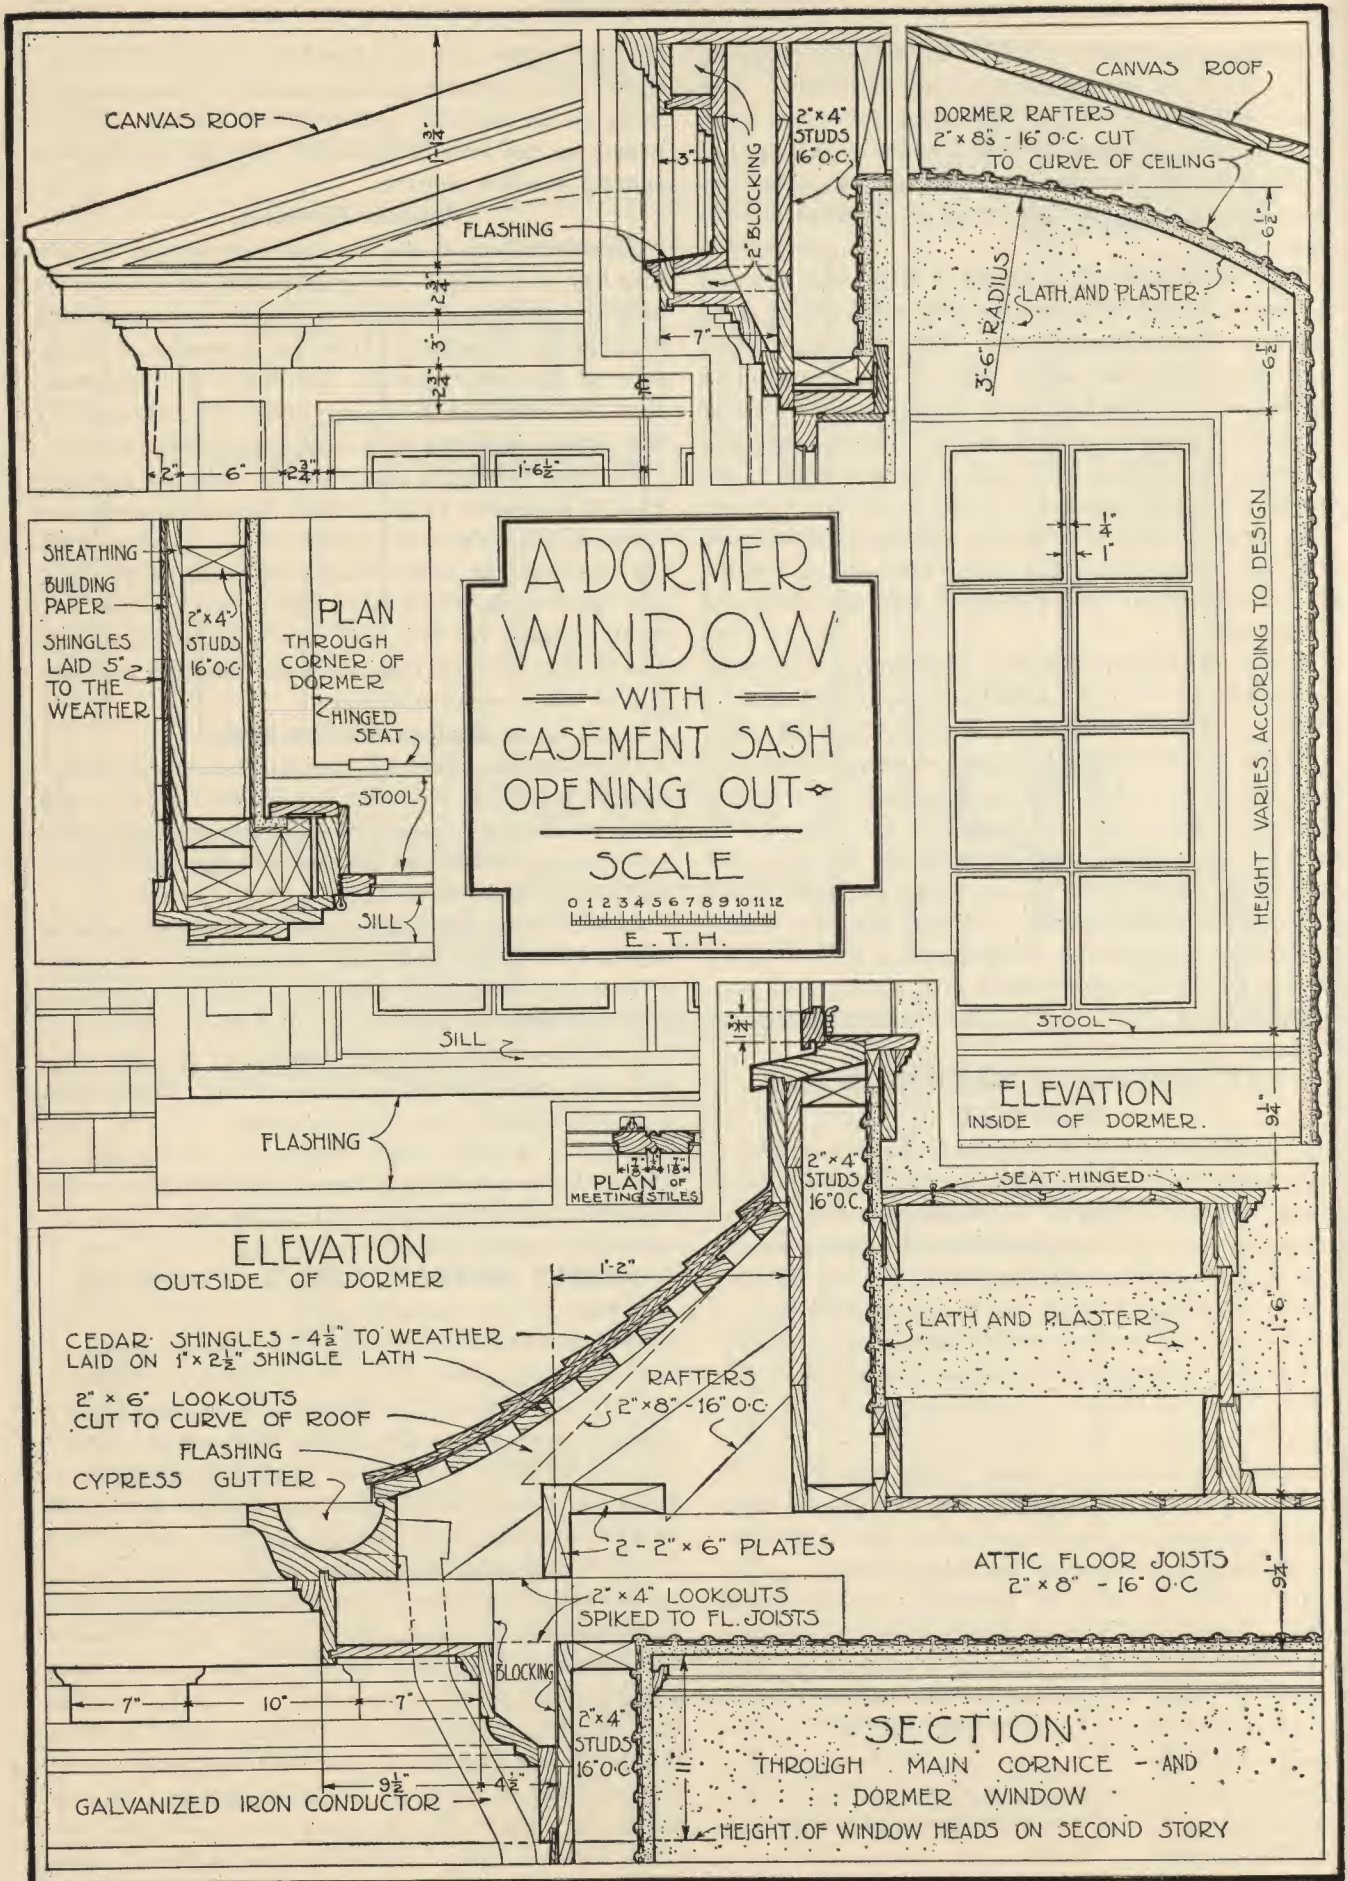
Plate XII. Details of a Dormer Window with Casement Sash Opening Out.
